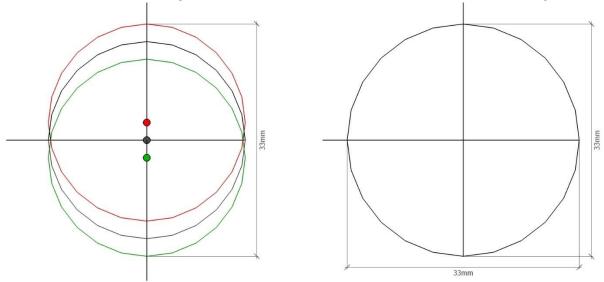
Fabrication tolerance bolt hole, length floor slab and final
